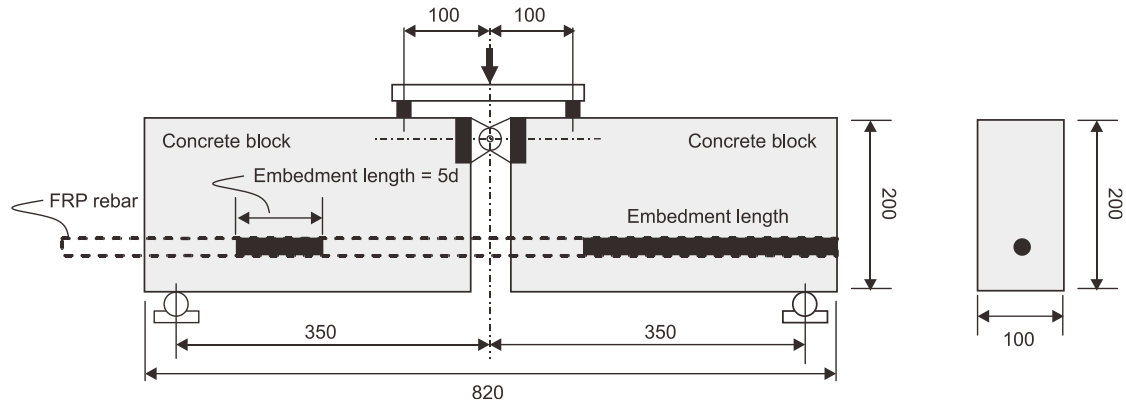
Beam end test setup for FRP bar to concrete according to EN 10080 [63]. (unit in mm).
